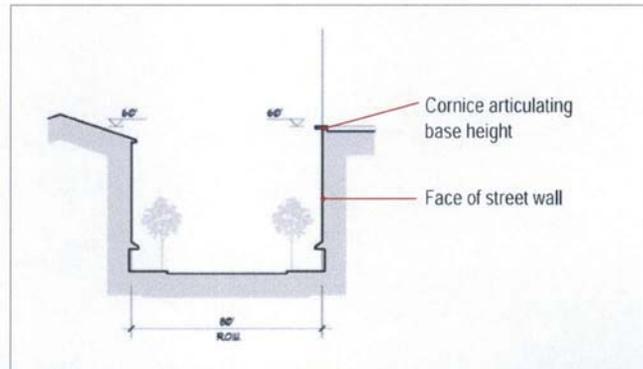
Street section with 3:4 proportions, with cornice articulation defining building base height.
